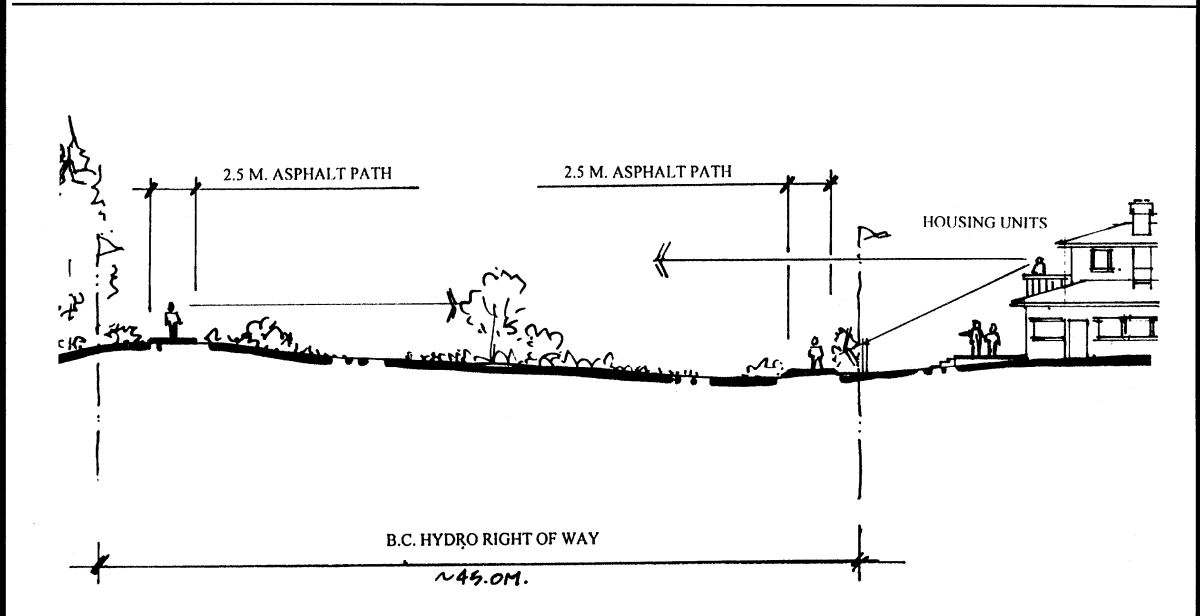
CROSS SECTION - B. C. HYDRO CORRIDOR TRAIL
